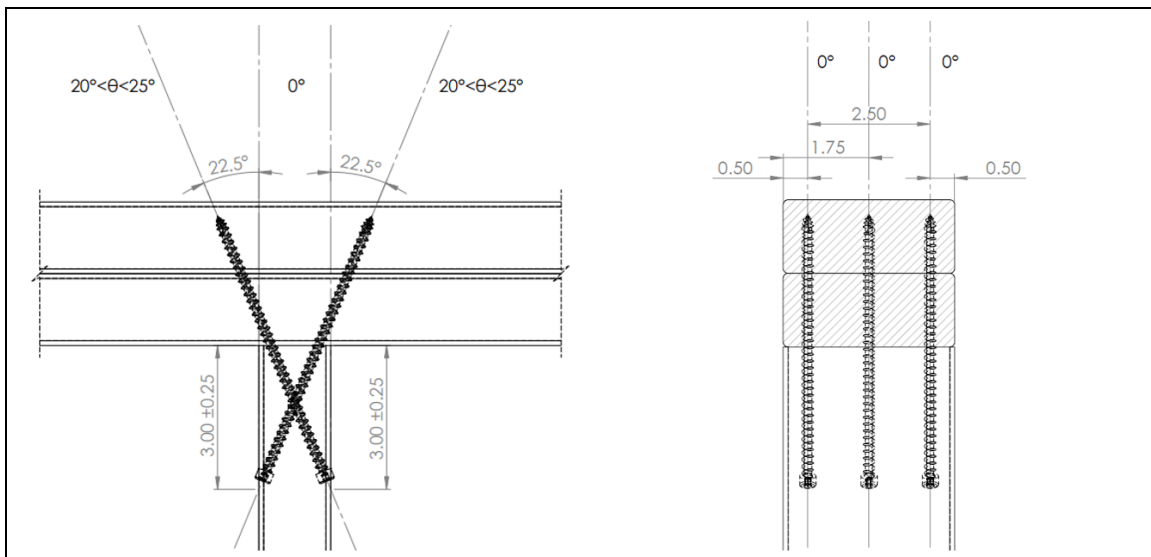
Stud to Top Plate – 22.5° (Angle), One 6" TRX Truss Screw Options
